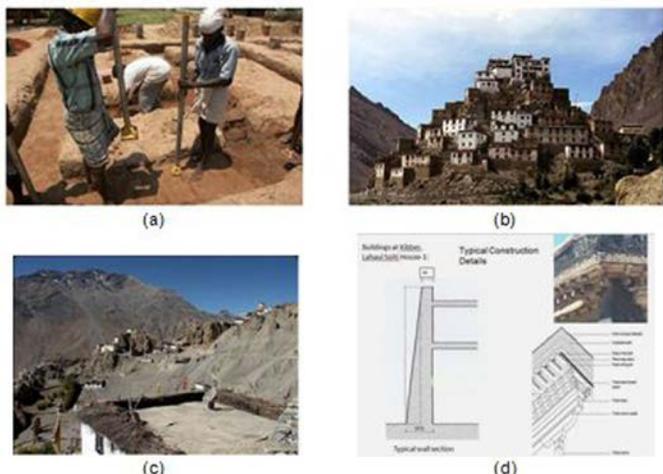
Views of Mud construction (a) Rammed Earth Construction (b) View of Kie Monastery (c) dwelling at Spiti valley (d) Construction details of the rammed earth mud houses.
